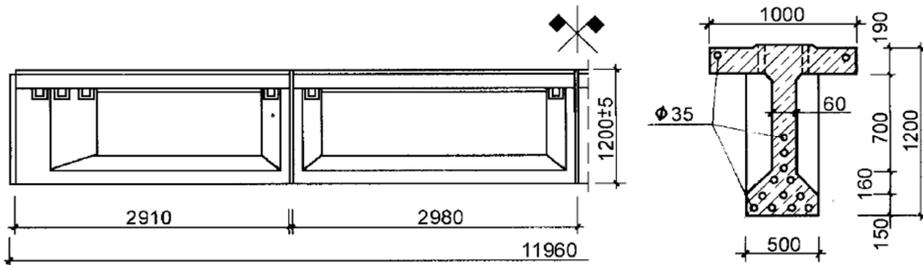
Example of post-tensioned prestressed crane beam, assembled from segments of type KBP-120-12 (dimension in mm) (Ajdukiewicz, Mames 2008)
